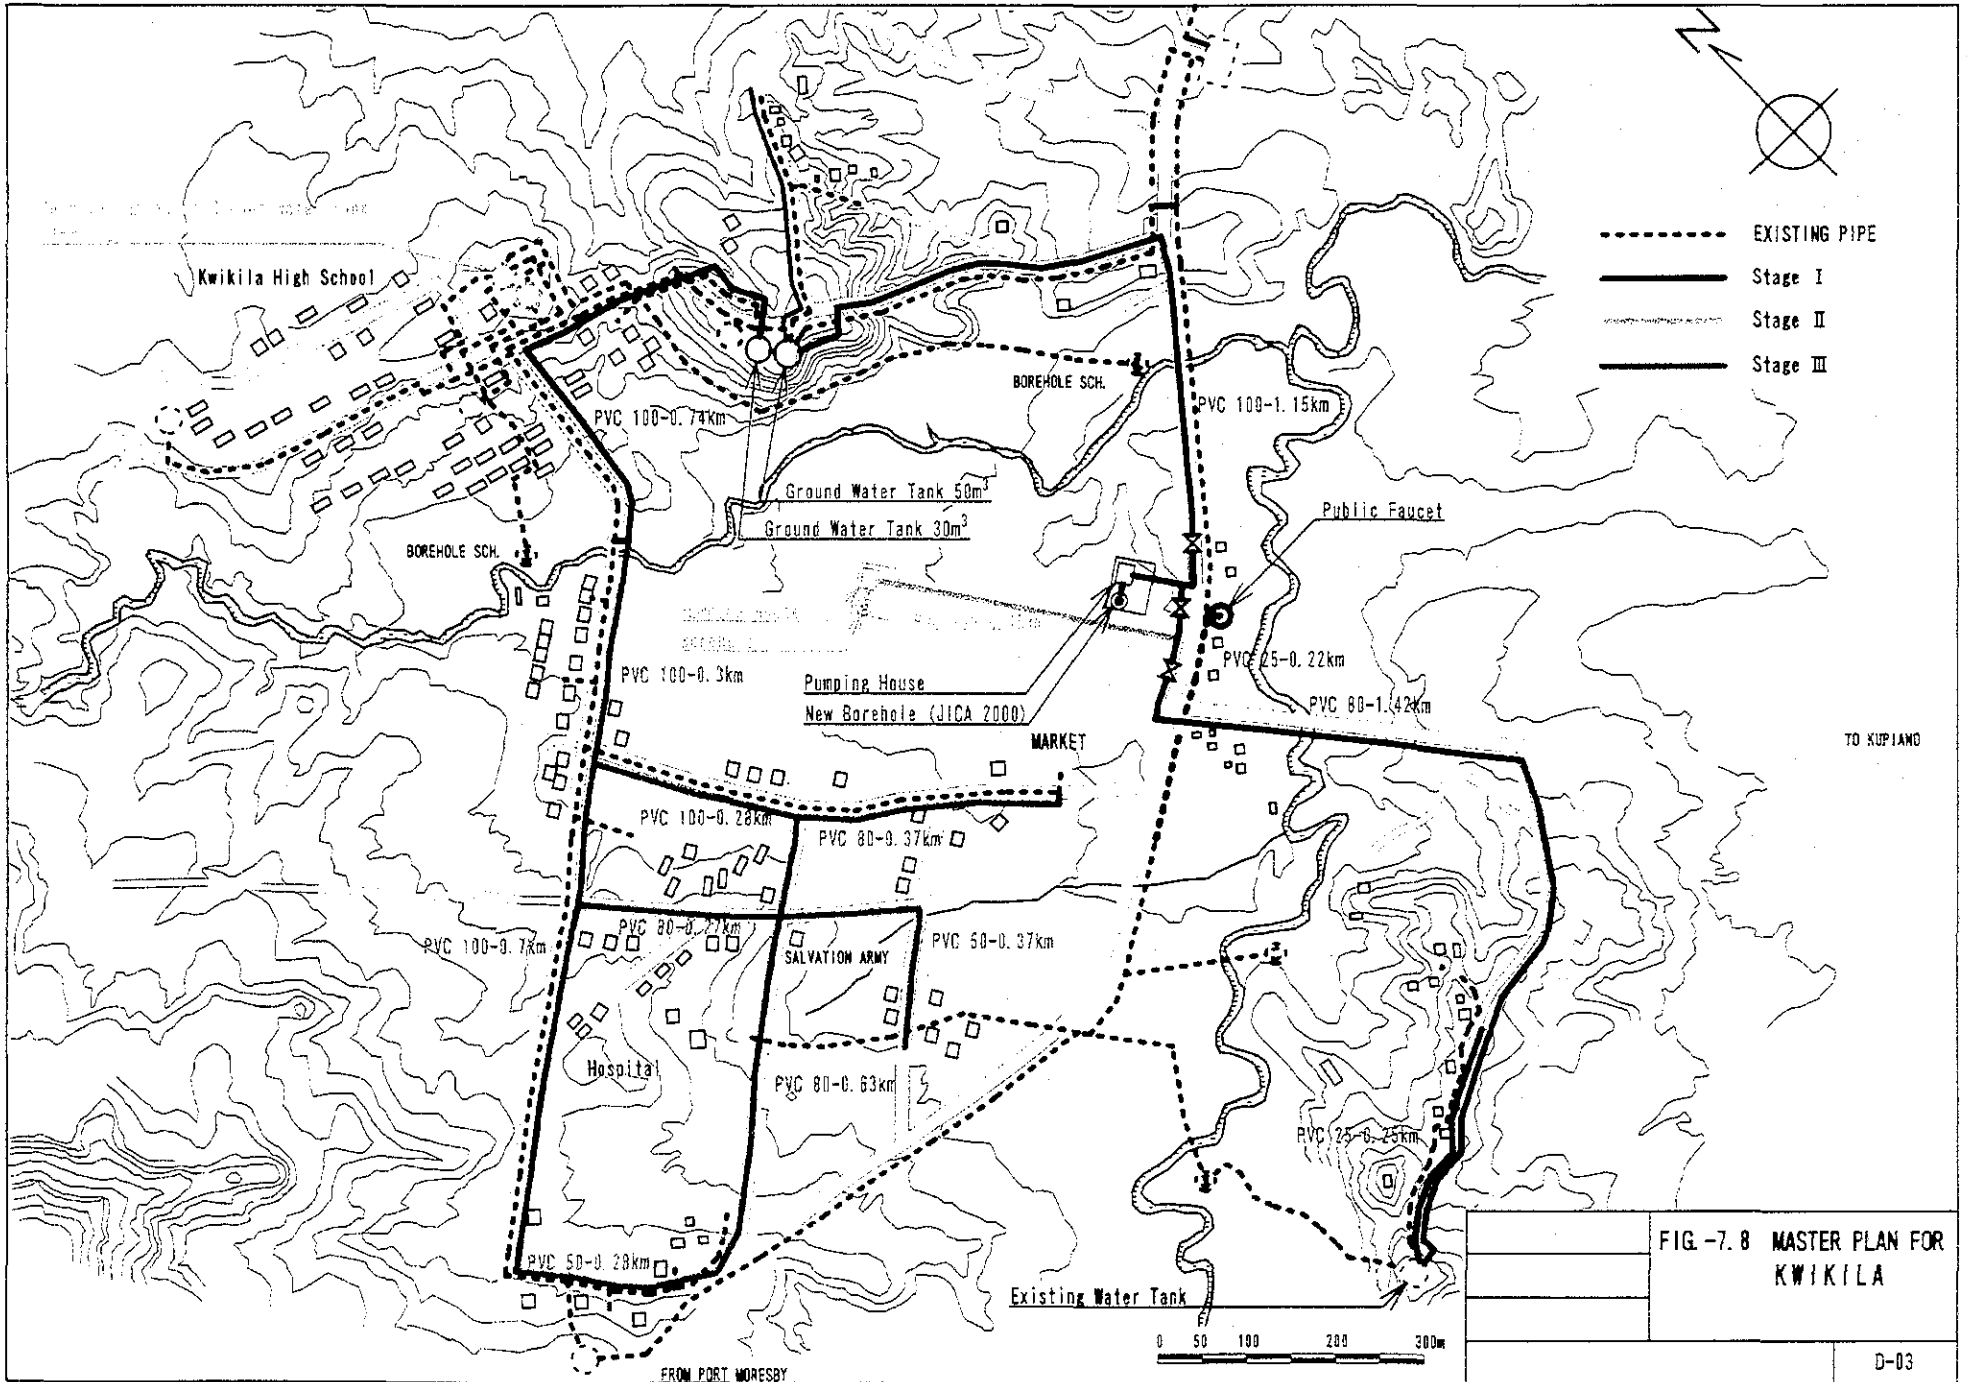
8 MASTER PLAN FOR KWIKILA
